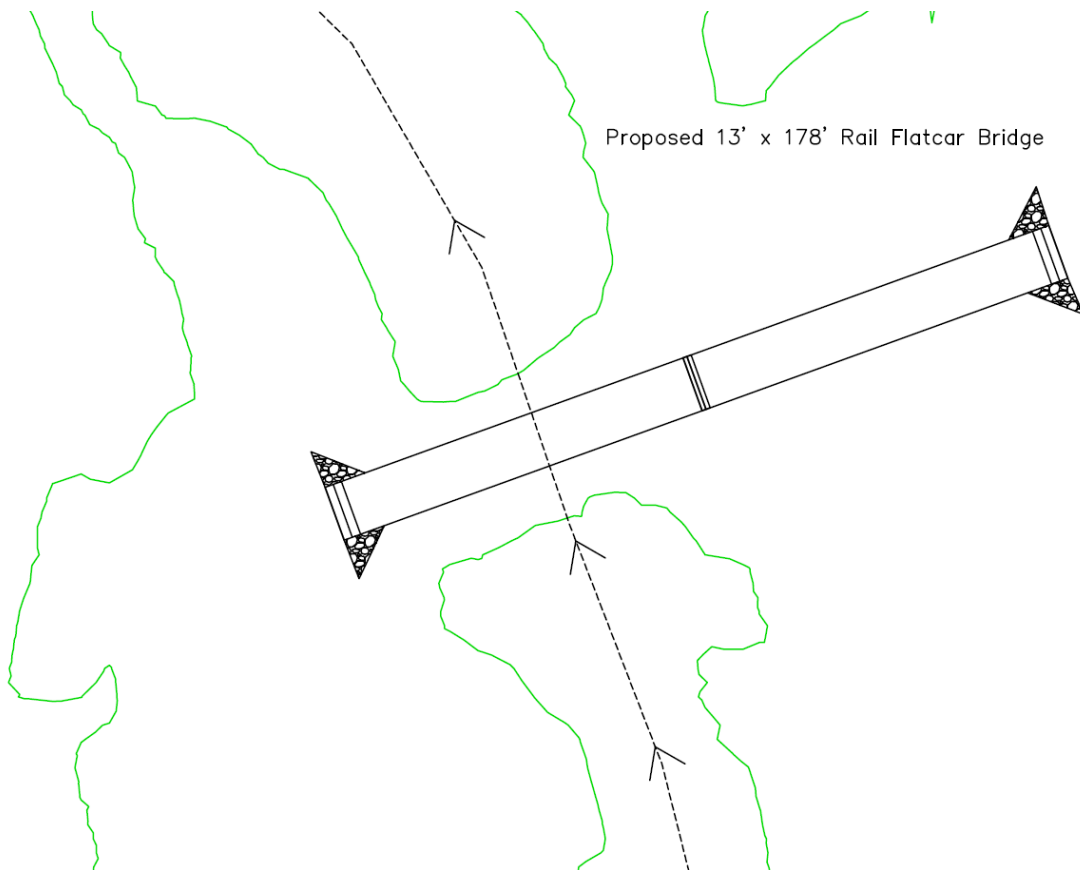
Site layout of culvert-crossing topographic contours and proposed bridge design
